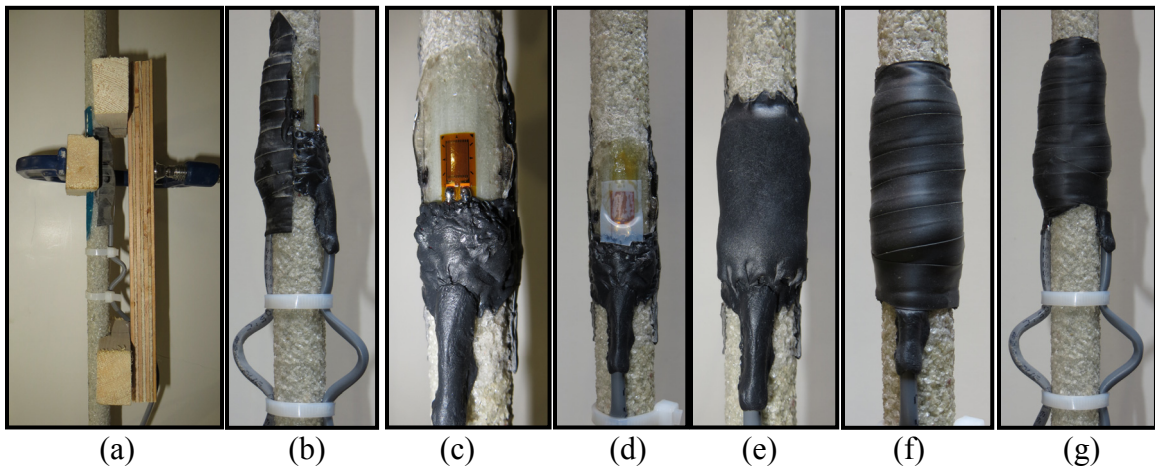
Step by Step Strain Gauge Installation on GFRP rebar
